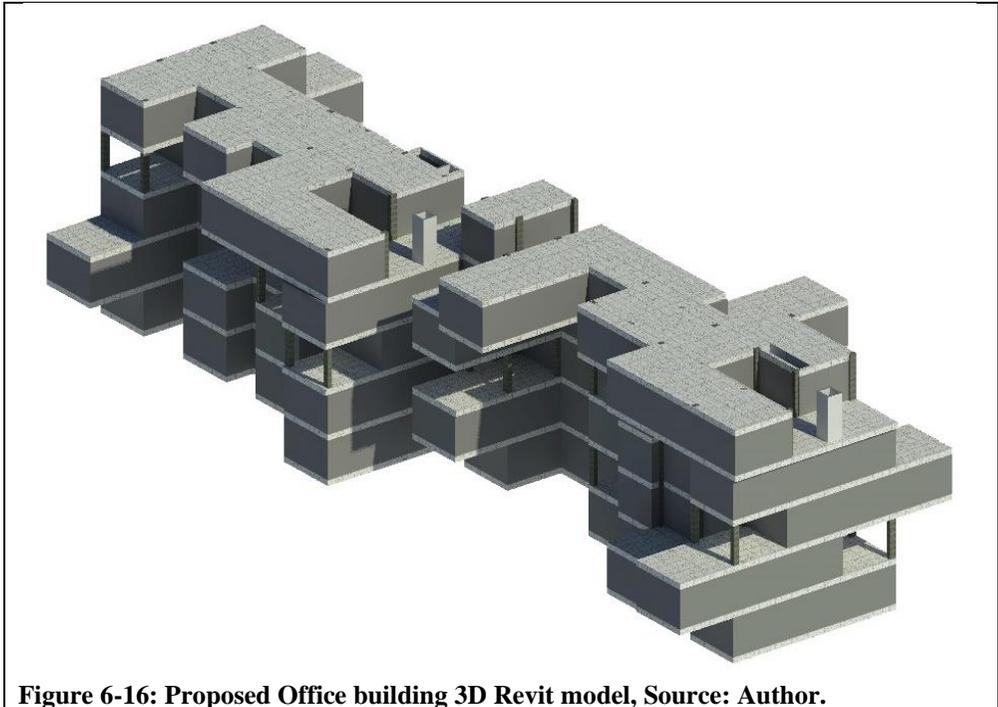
Proposed Office building 3D Revit model, Source: Author.
